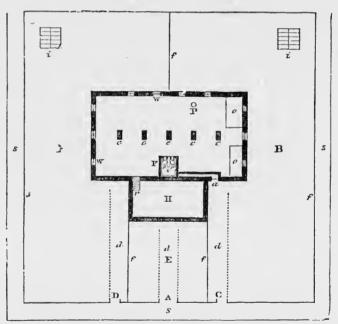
,-BLOCK PLAN OF GROUNDS AND SCHOOL-HOUSE FOR A PUBLIC OR HIGH SCHOOL,
